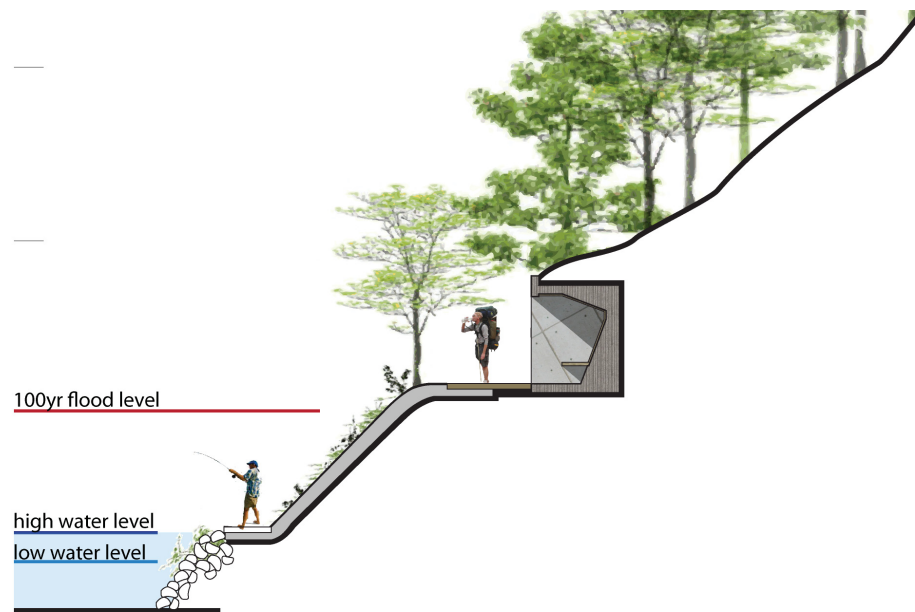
Landscape Section "CC" enlarged. The steep embankment is reinforced to prevent erosion and the Shelter Pod is embedded into the hillside. The pod acts a rest area and landslide shelter. A concrete outer structural wall is lined on the with a wood finish and bench providing a more comfortable interior space.
